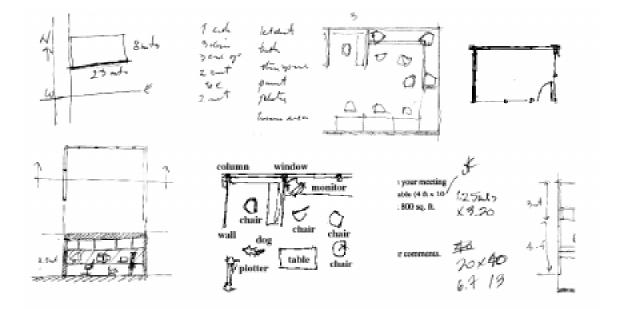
Mario's drawing conventions: (1) small site plan with direction north, and dimensions, hatched wall, (2) copy down design program, (3) drew same kinds of object in sequence, 3 monitors, 3 tables and 3 chairs, (4) door, wall and window, (5) cut section to show lighting and space, (6) use of furniture to test how the space works, (7) dimensional reasoning, conversion of number calculations, and (8) labeling the dimensions on side
